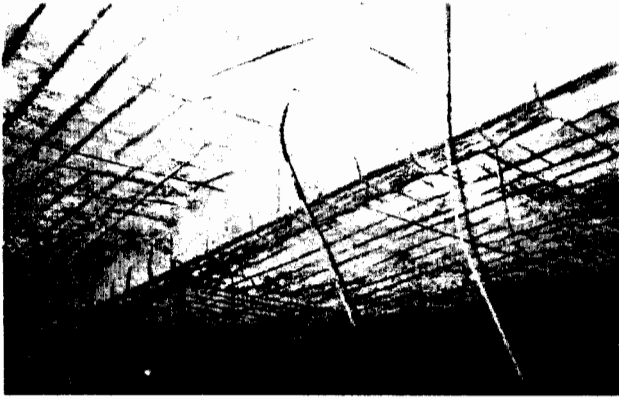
Slab and beam reinforcements exposed due to spalling of concrete
